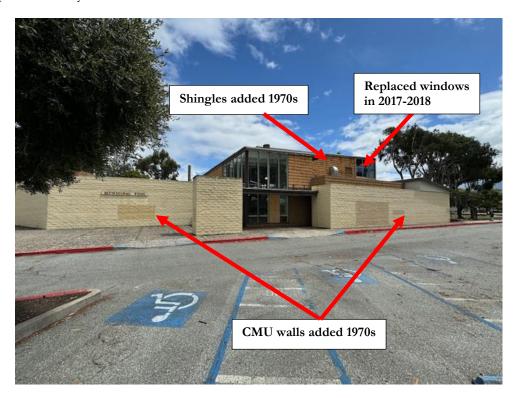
View of the front or northwest elevation of the Sherwood Recreation Center (April 2024).
